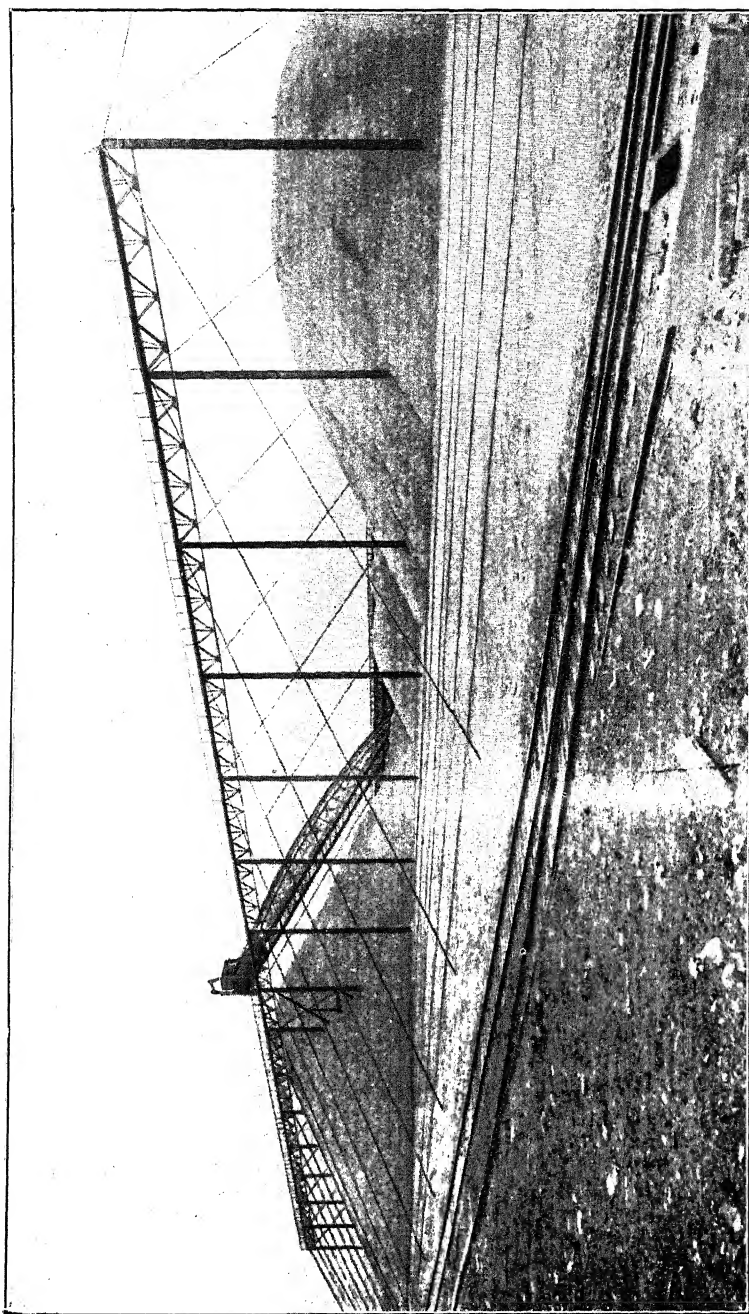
RANSOM PLANT. GENERAL VIEW OF COLONNADE AND TRAVELING-TRIMMER.
